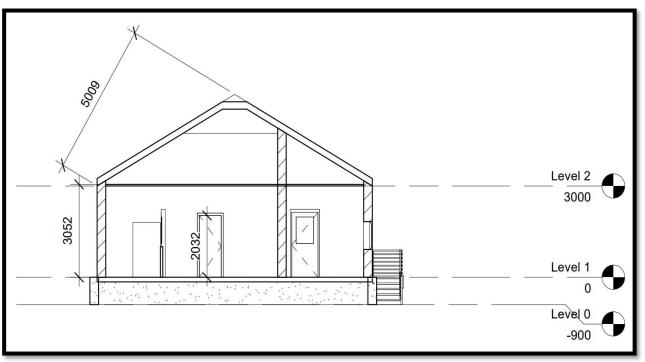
SECTION FOR MODAJ VILLAGE BANK
